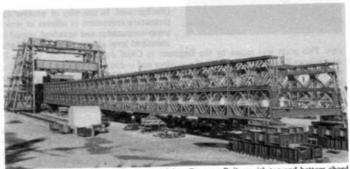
A 200 foot span Triple/Double Mabey Compact Bailey, with top and bottom chord reinforcement, under test load at Christchurch. The 500 ton test rig may be compared with that used to test the original Bailey in 1941 and shown in Photo 3 (Part 1).
